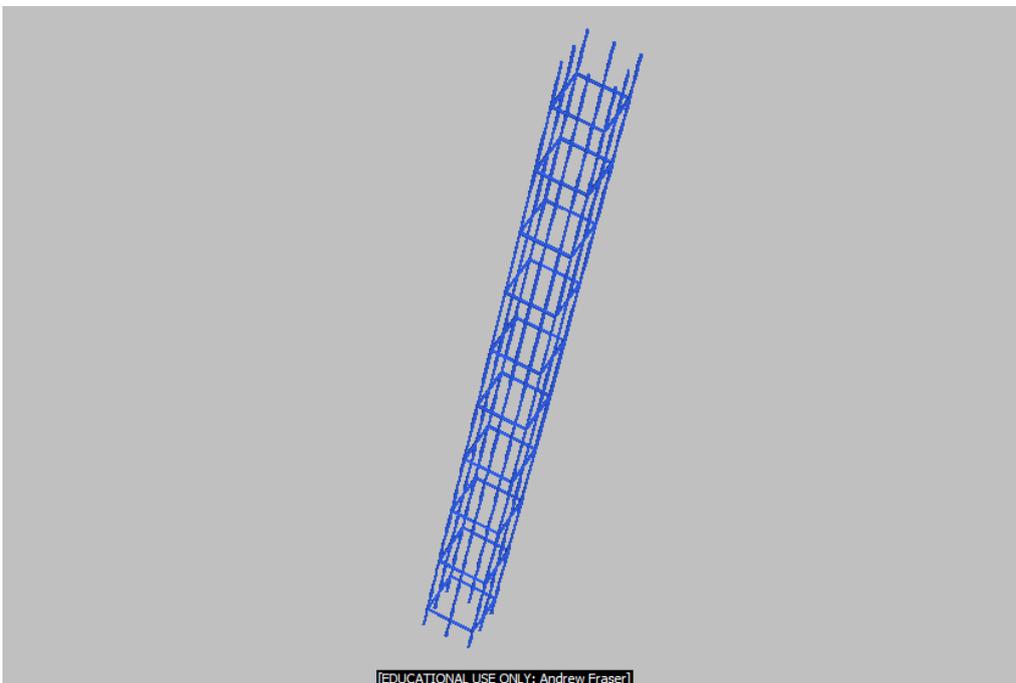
Reinforced Concrete Column Reinforcement Detailing
